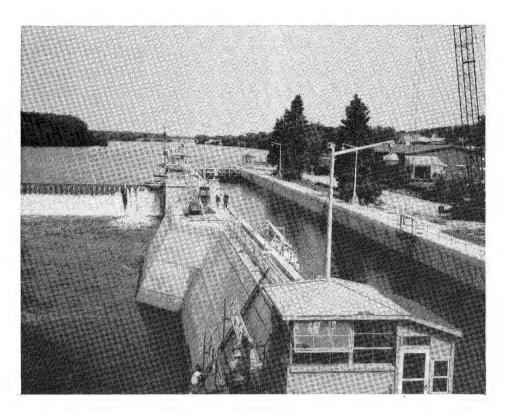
Precast concrete panel installation completed, Troy Lock (from Miles 1993)
